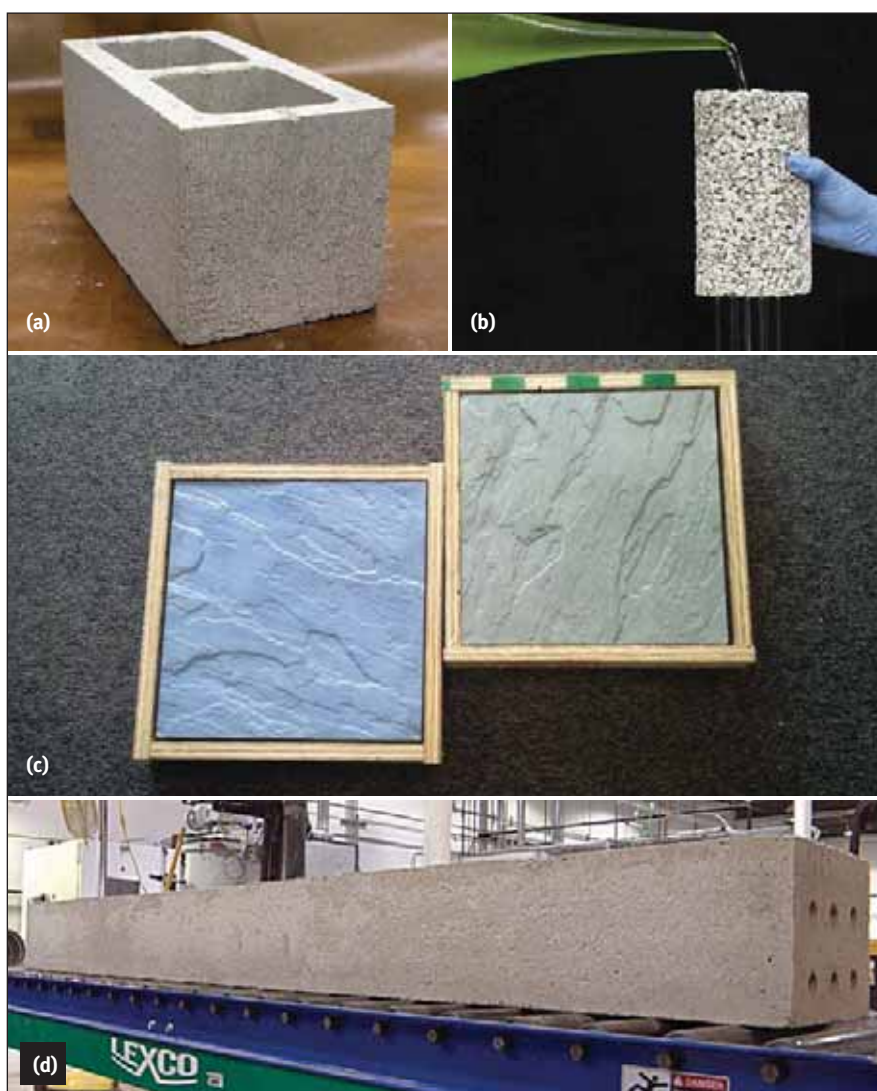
(a) concrete block; (b) pervious concrete; (c) wet-cast concrete tiles; and (d) concrete railroad tie.
